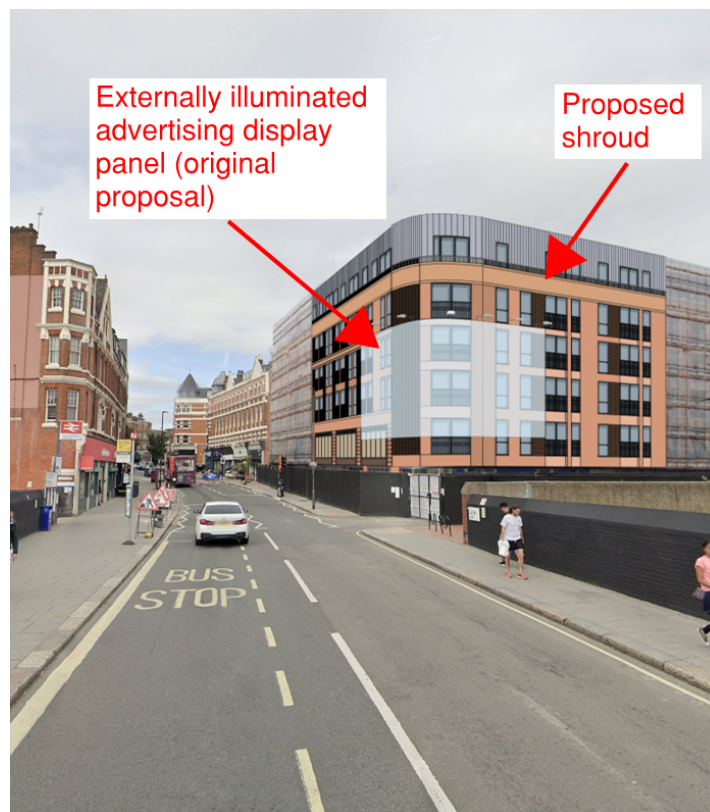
originally proposed shroud and illuminated advertising panel at application site
